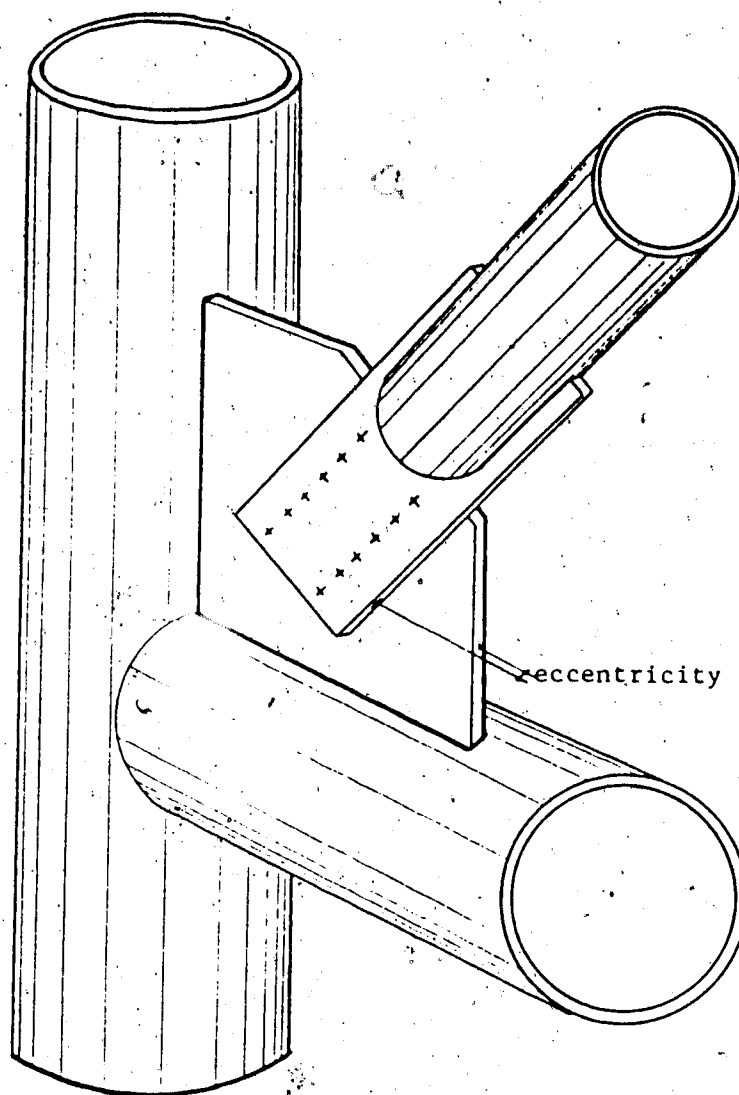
Gusset Plate Connections of Unstiffened Tubes
